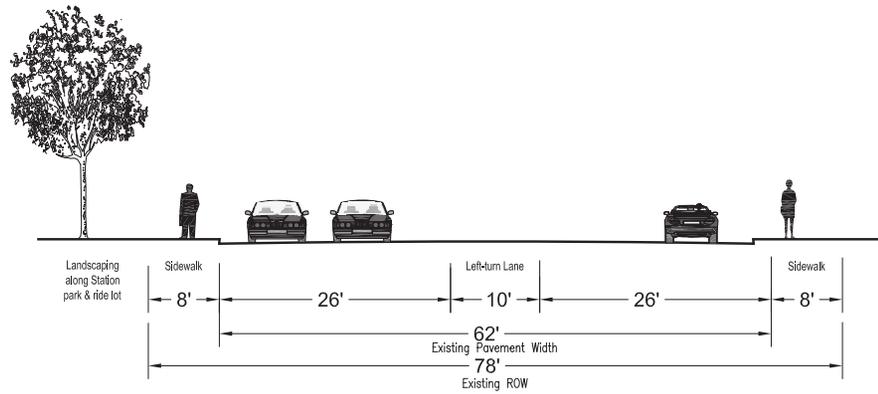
TYPICAL SECTION - RESIDENTIAL
